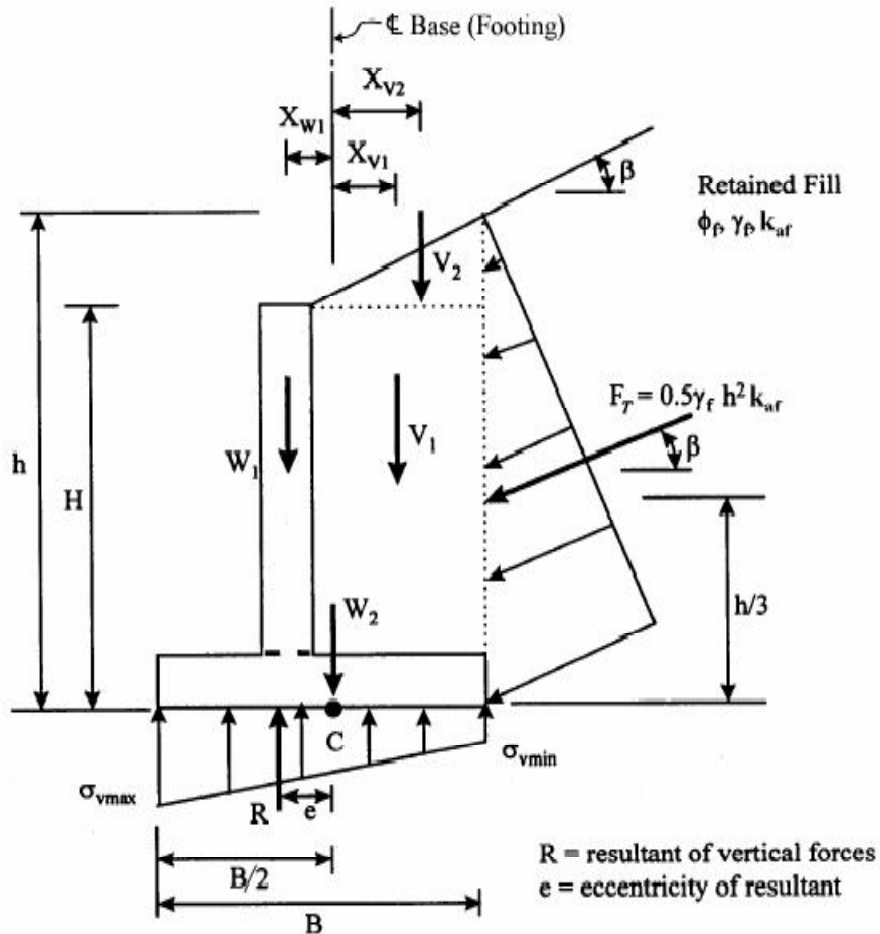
Bearing Stress Criteria for Conventional Wall Foundations on Soil.
